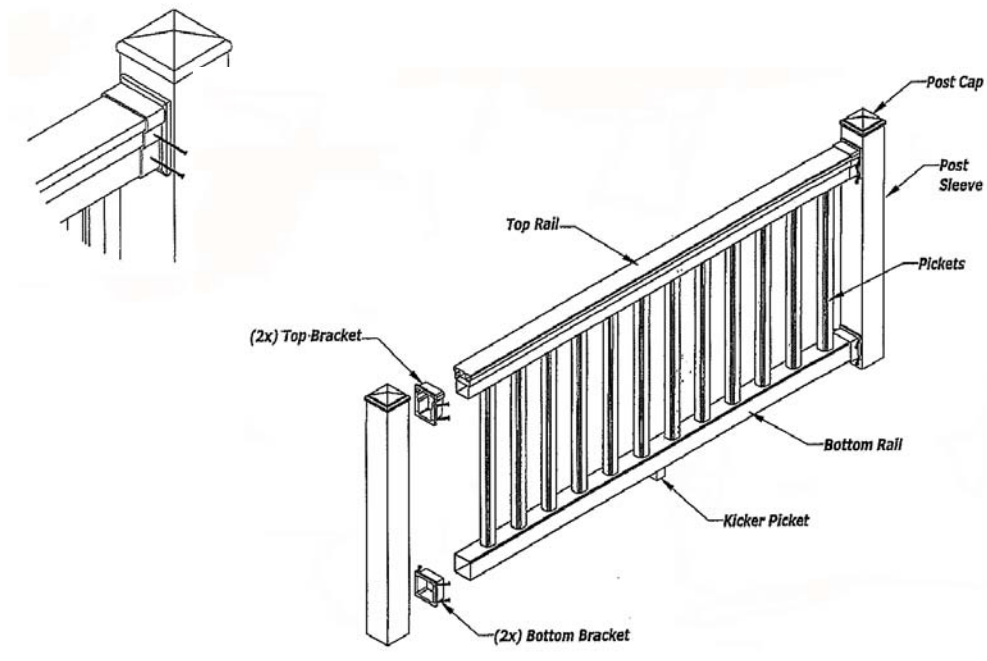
GUARDRAIL ASSEMBLY DRAWING
